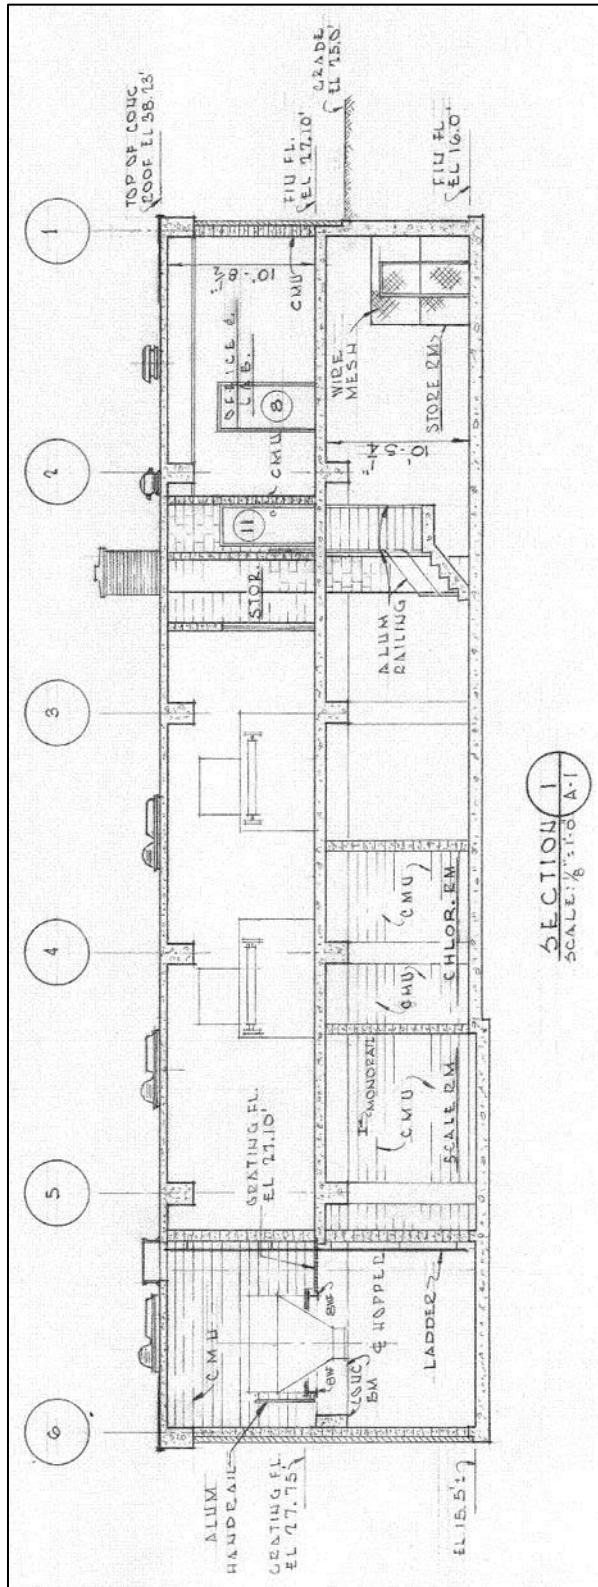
Record drawing showing longitudinal Section of Operations Building built 1965, converted to present Sludge Processing Building in 1993. Clip from sheet A-3, Operations Building, Wall & Building Sections (Metcalf & Eddy, 1963).
